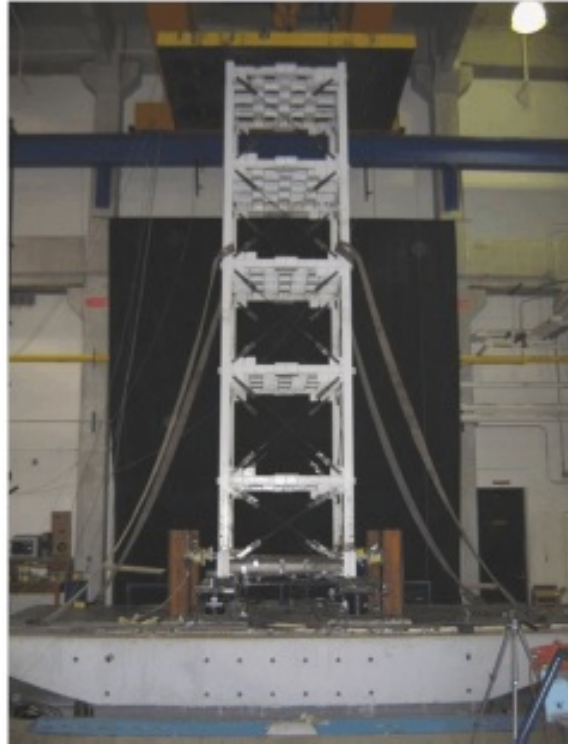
Bridge pier model specimen (from Pollino and Bruneau 2008)
